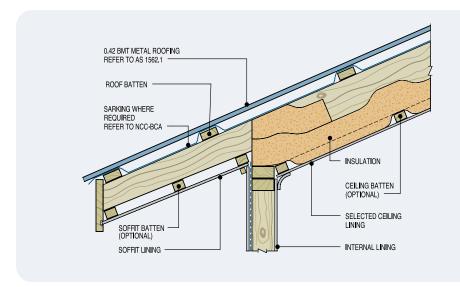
Cathedral Roof/Ceiling Construction. Section through roof
